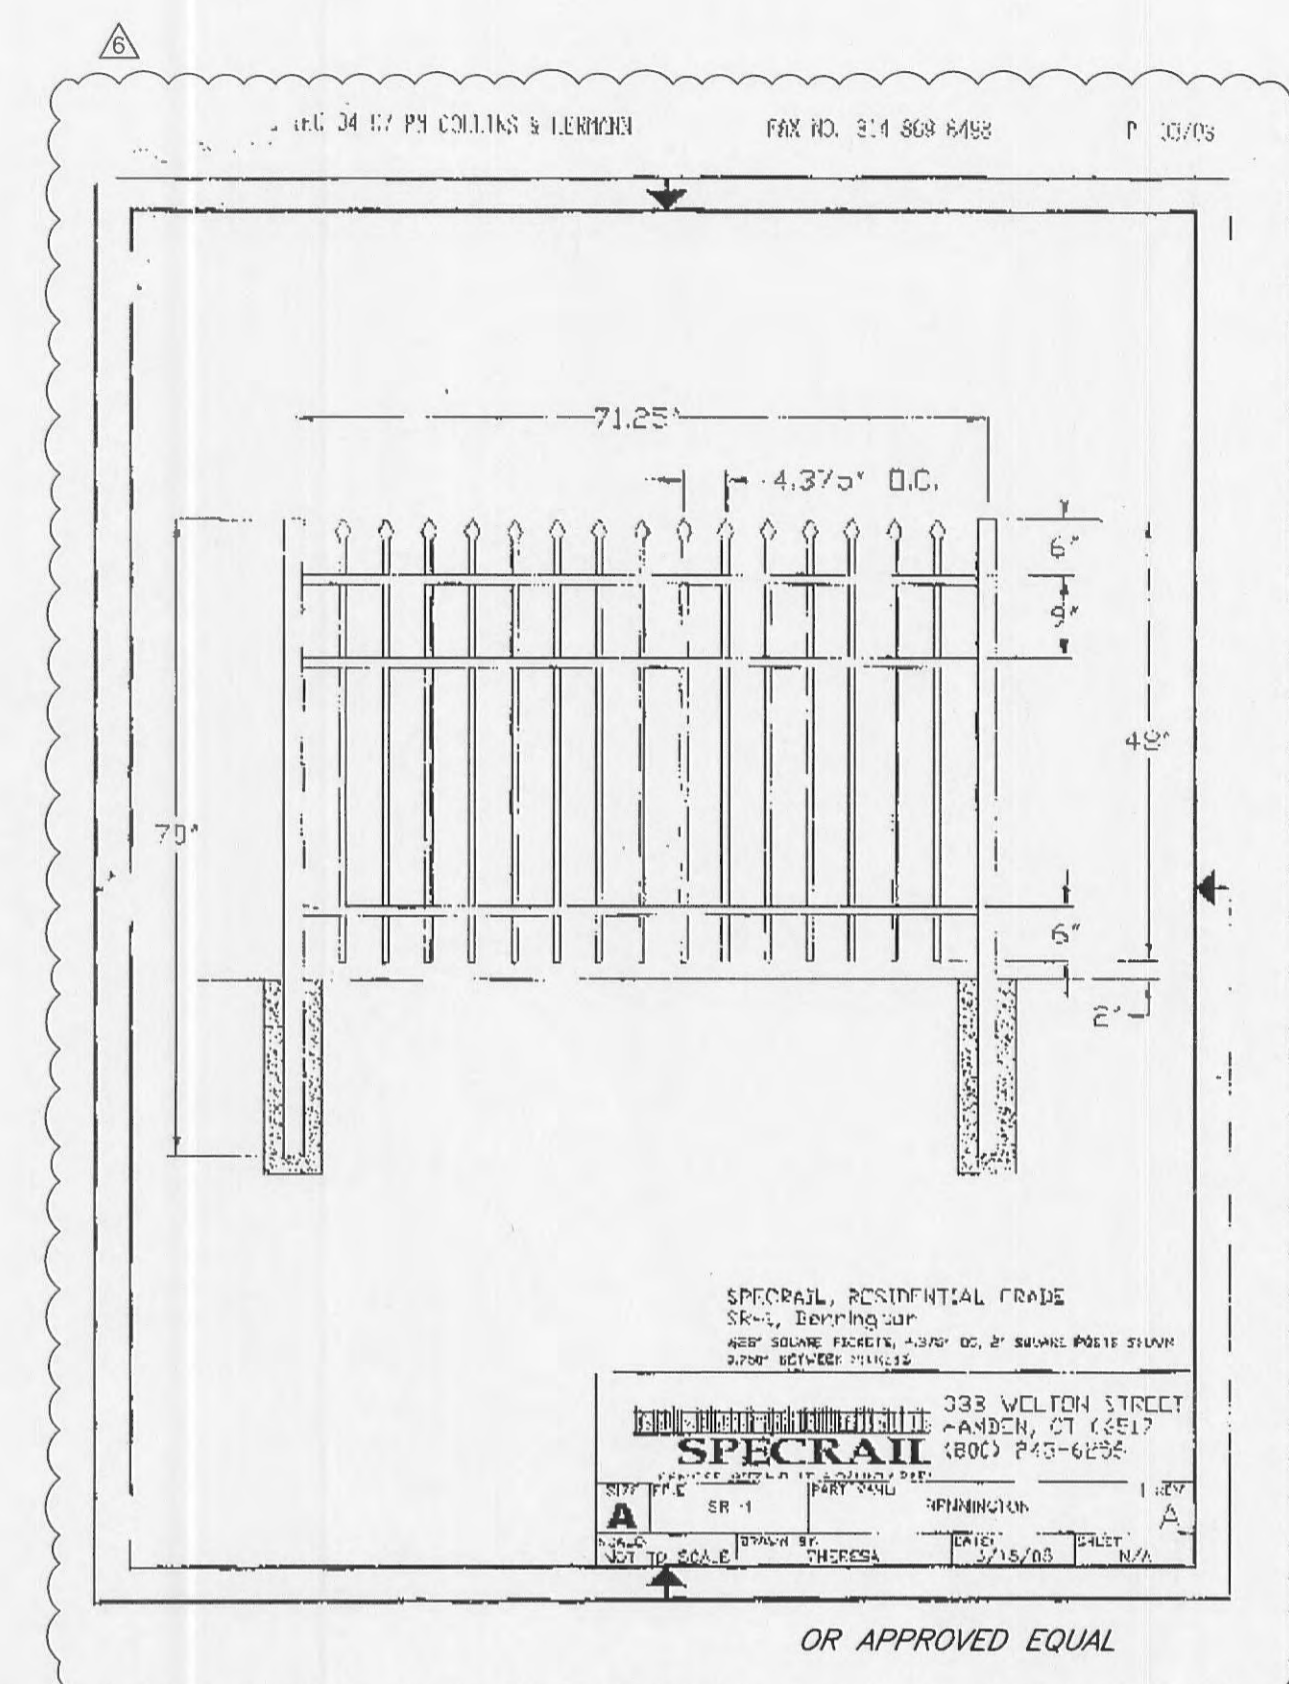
DETAILS FOR COMPONENT BAR PRODUCTS BUILDING EXPANSION
